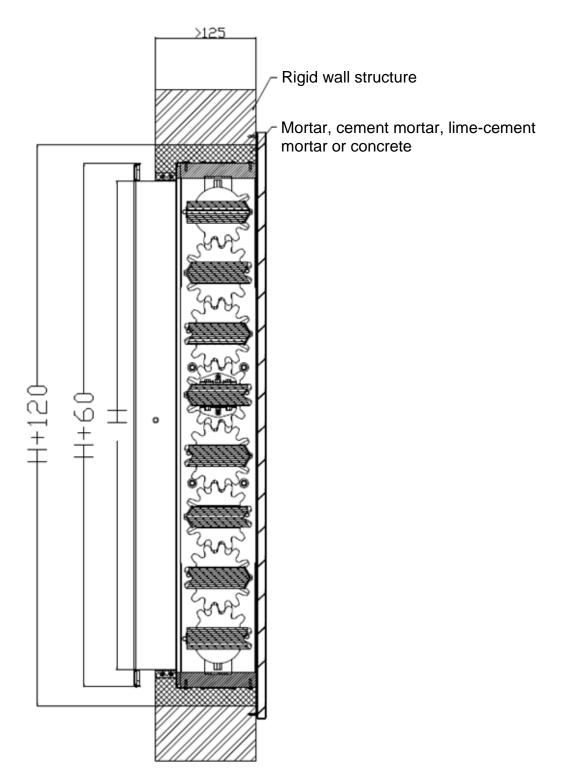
The way of installing WKP fire dampers in structures thicker than 125 mm
